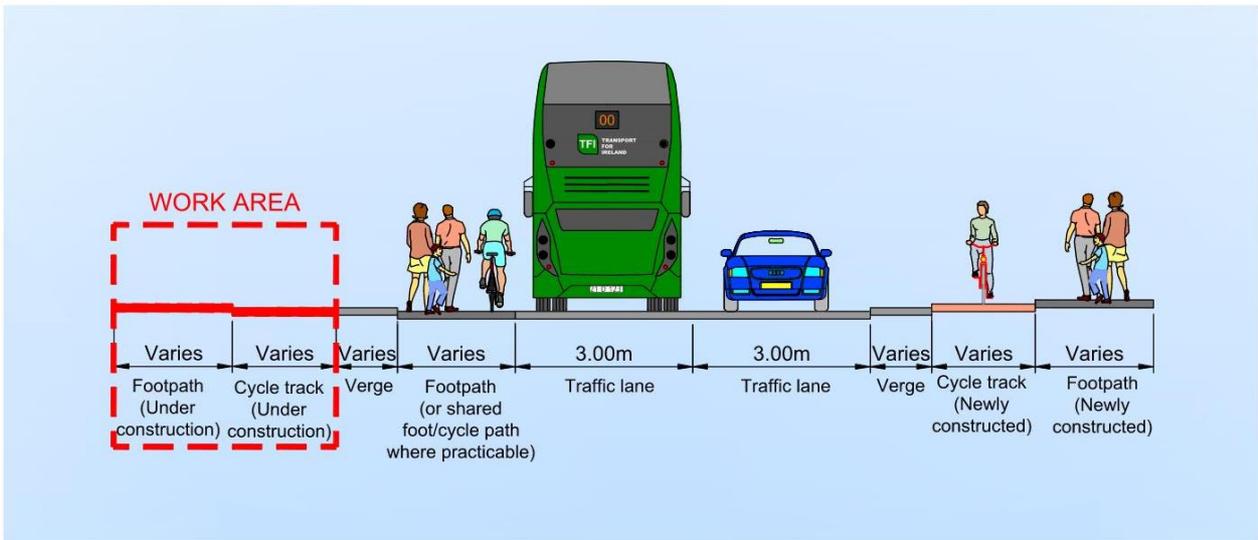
Traffic Management Cross Section, Section 2a – Stage 2
